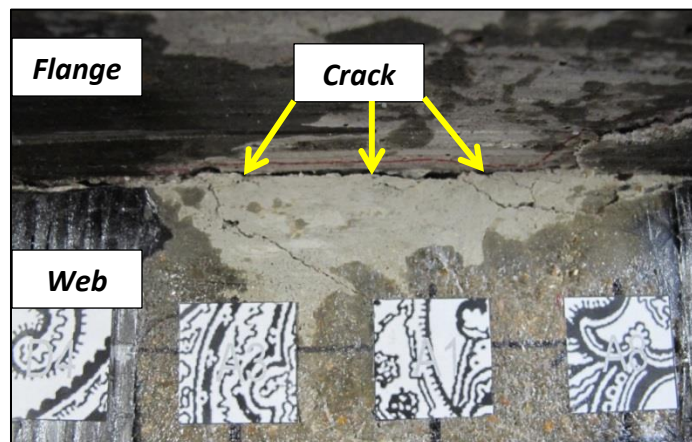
Cracking pattern of west face of 14-3-Bi-S
